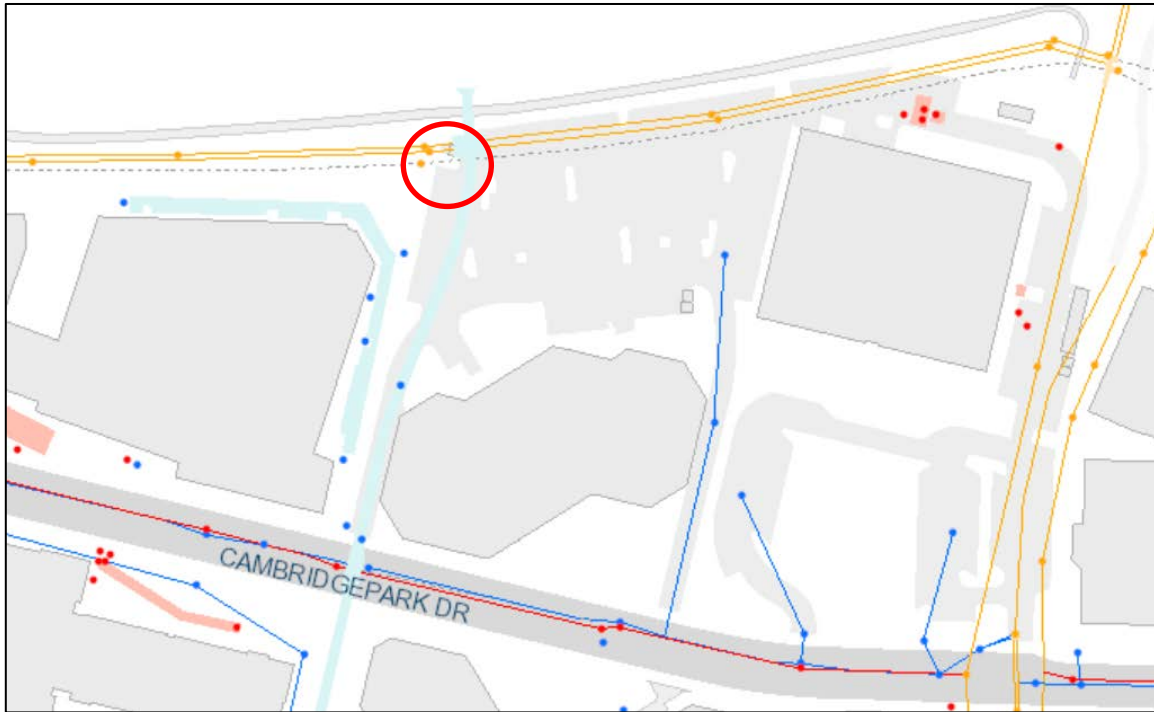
Cambridge GIS – Sewer and Drain Outfalls
